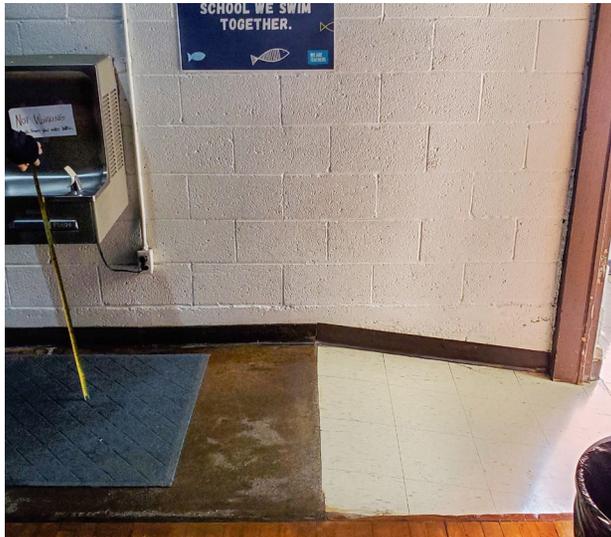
A non-compliant ramp that is steeper than allowed by ADA for an accessible route. A drinking fountain projects out greater than 4" into the accessible route, which is also not allowed by ADA.
